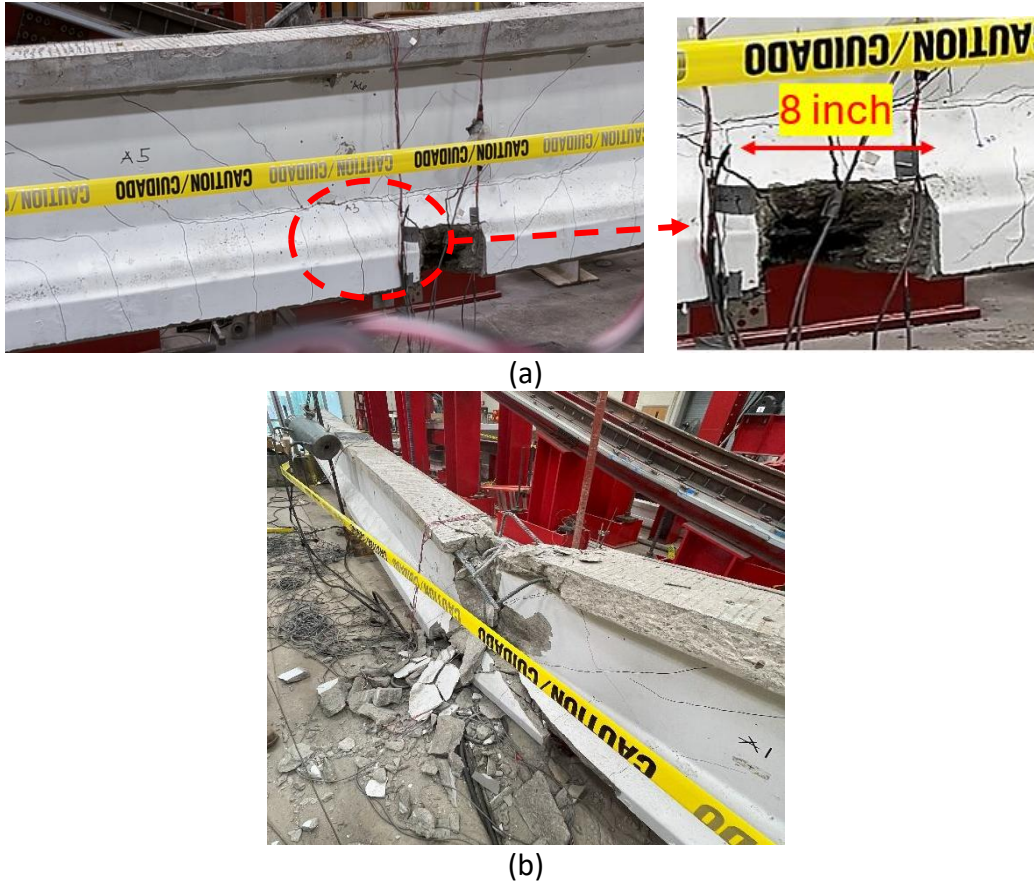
Girder G03 (a) The testing of the girder, (b) Failure of the girder.
